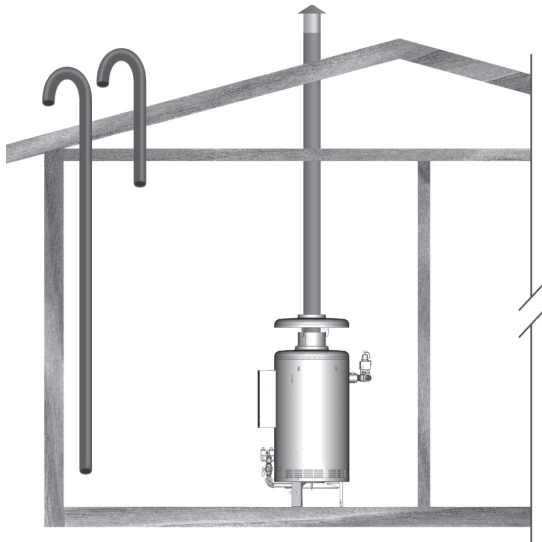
OUTDOOR AIR THROUGH TWO VERTICAL DUCTS
